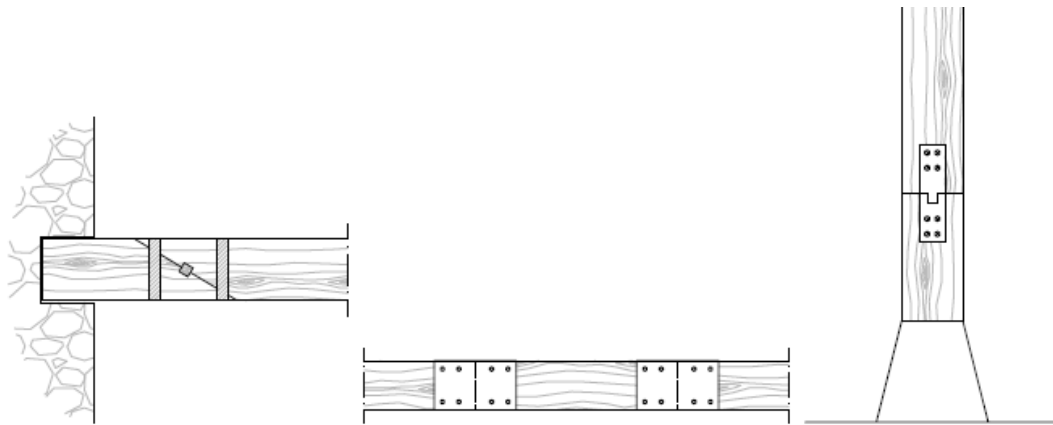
Examples of section replacement, using metallic connections [11].
